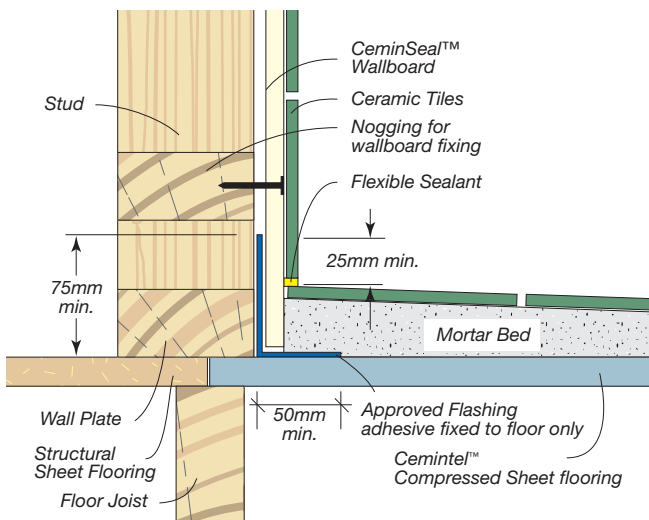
Perimeter Flashing – For Step-Down Slab in General Wet Area
